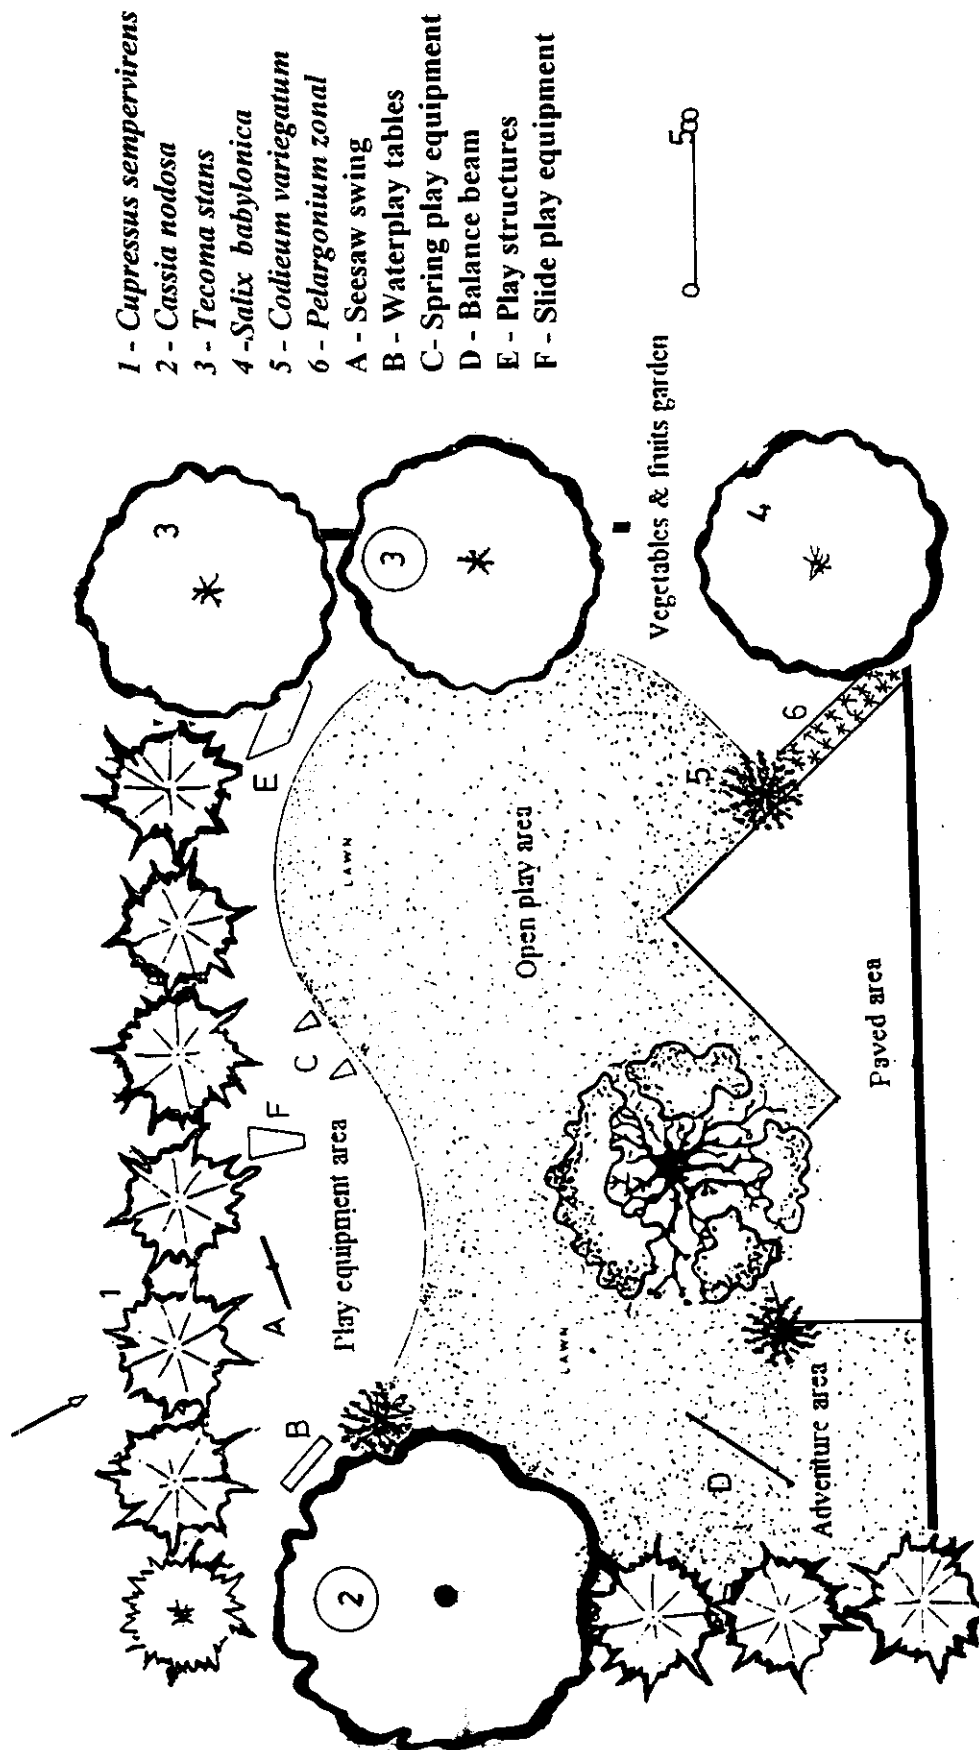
A proposed design for kindergarten garden in an area 400 m
